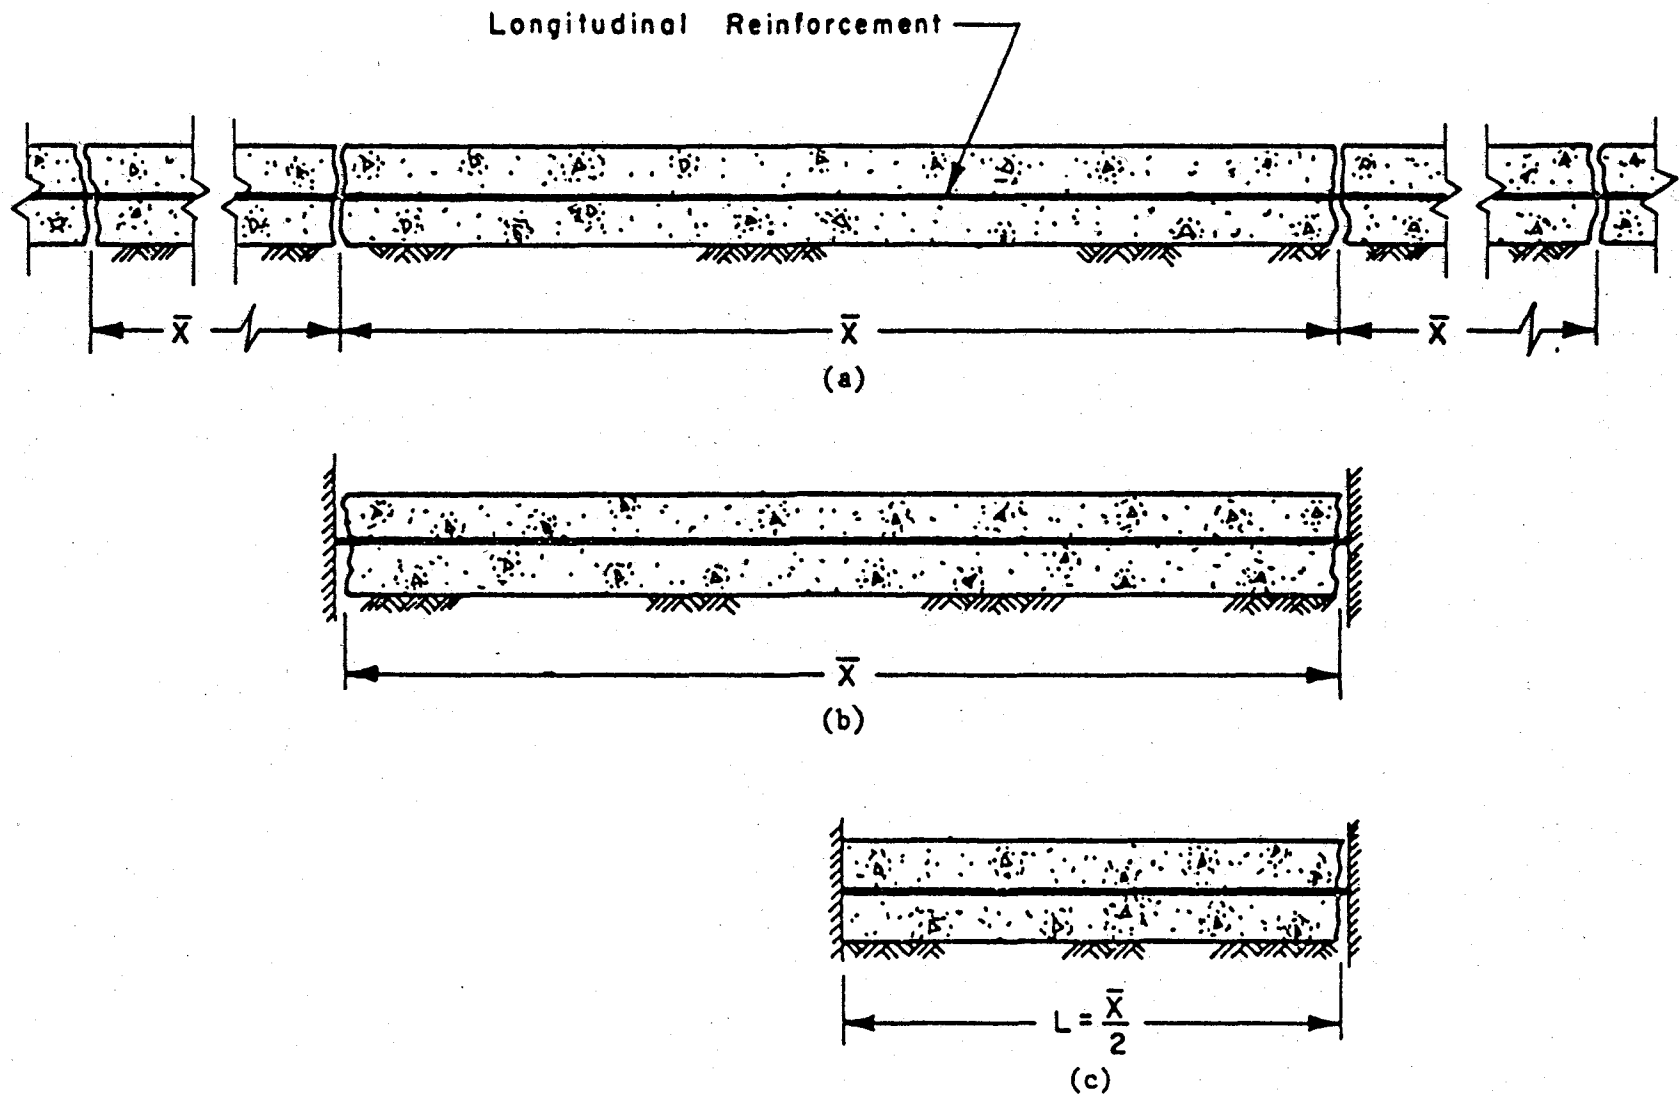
CONTINUOUSLY REINFORCED CONCRETE PAVEMENT GEOMETRIC MODEL. (REFERENCE 18)
